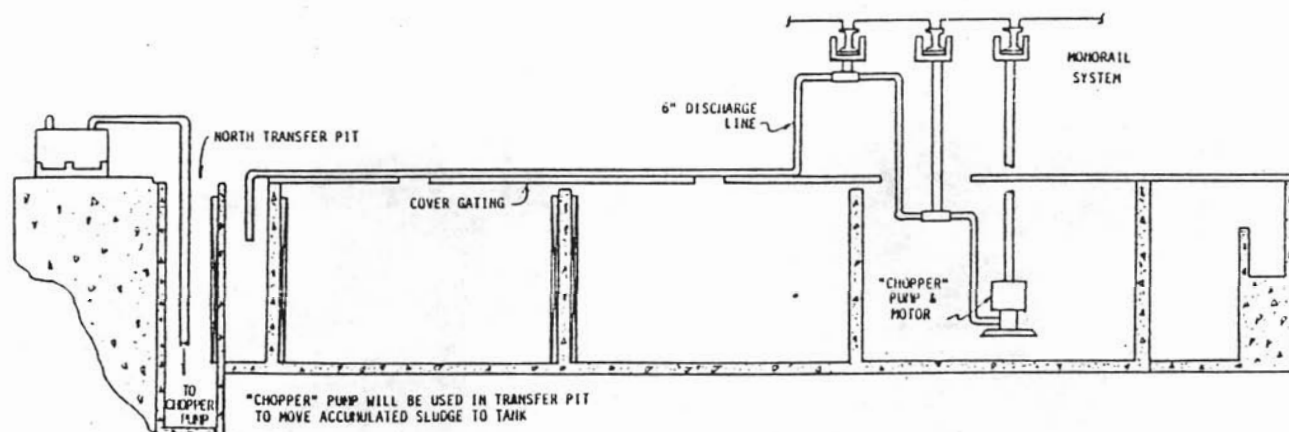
Elevation View K-West Fuel Storage Basin.
